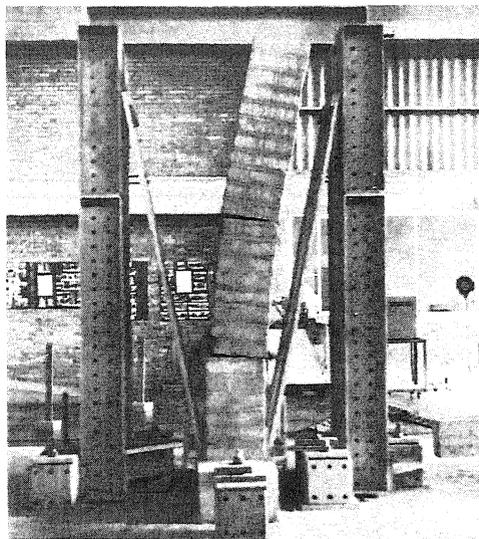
Cracking and Overturning of Wall 0.40 x 1.20 x 2.80 m.
